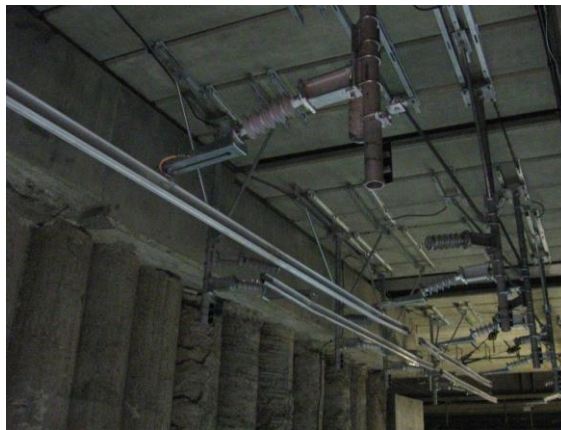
Conductor Beam Neutral section located within Canal Tunnel
